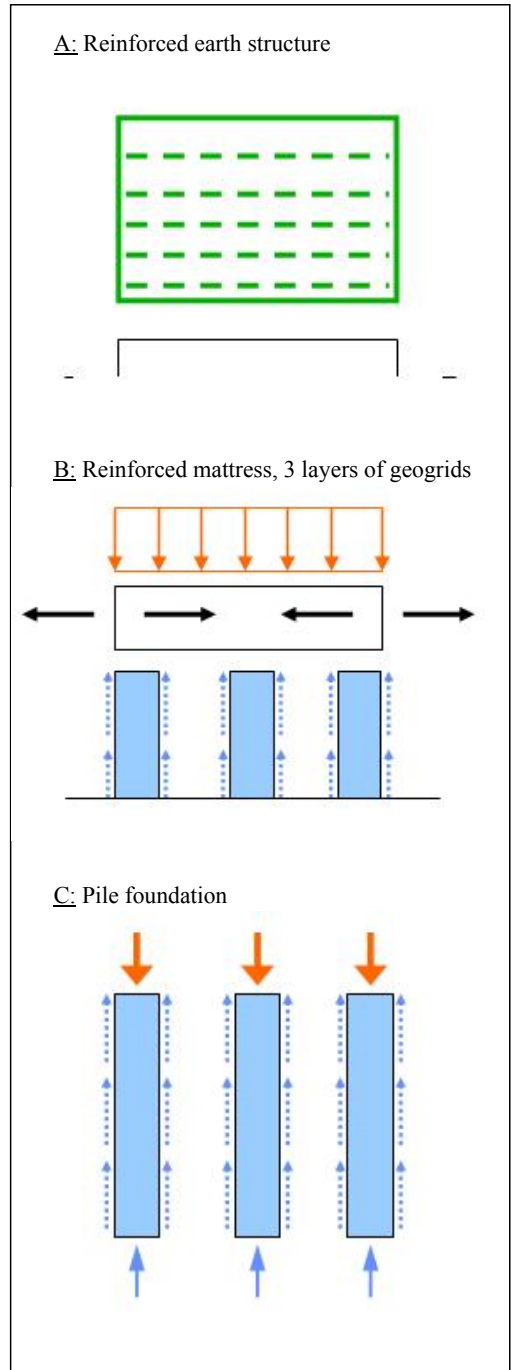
Three-element system (reinforced soil structure, reinforced mattress and pile foundation)
